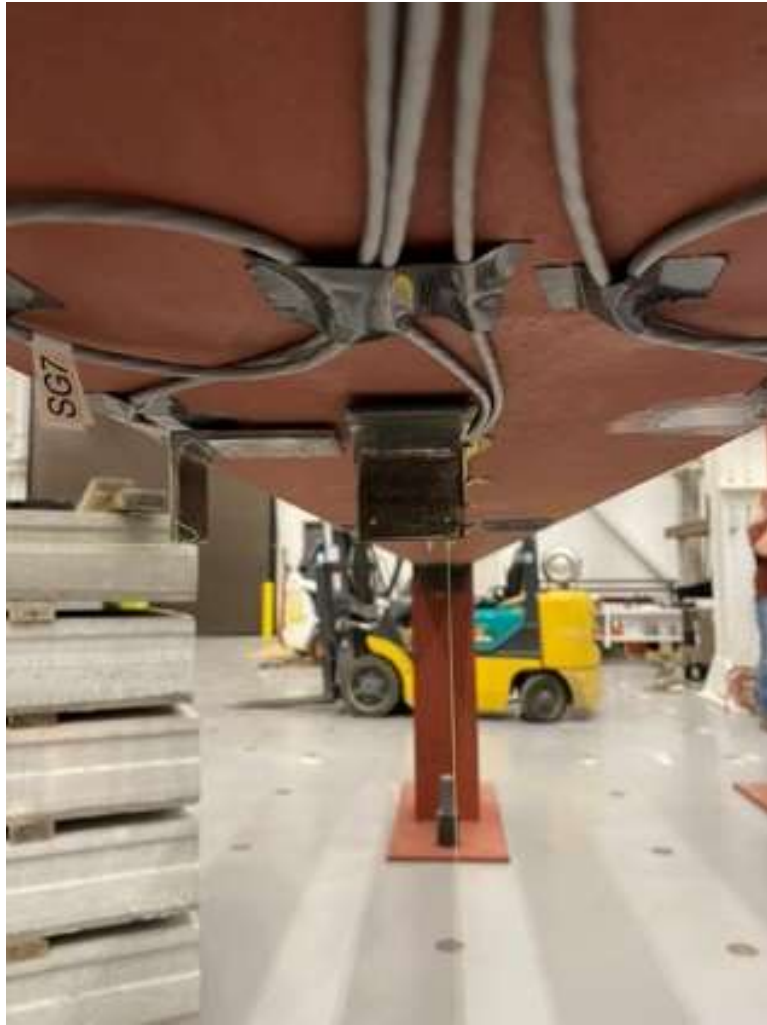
Edge beam bottom flange string-pot rotation and displacement connections
